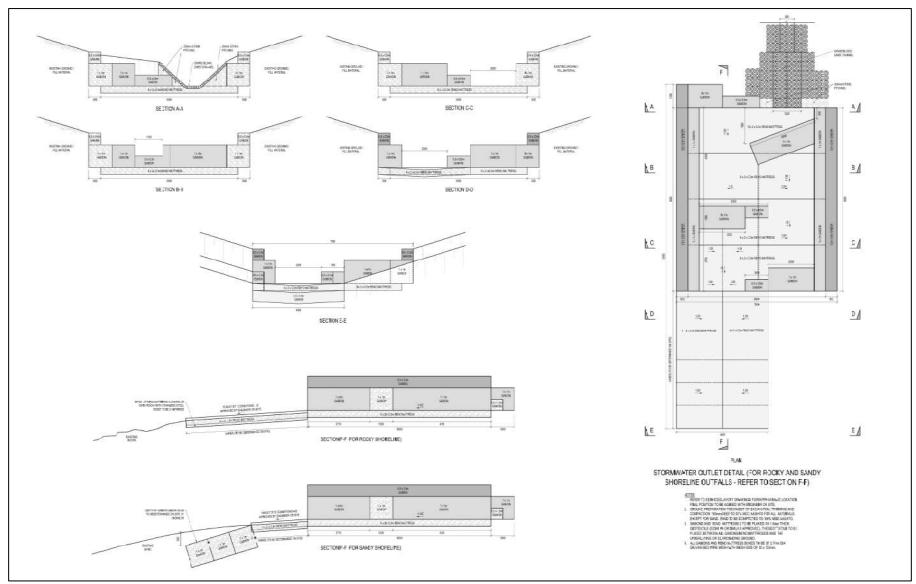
Detailed design of stormwater structures provided by the CDC.
